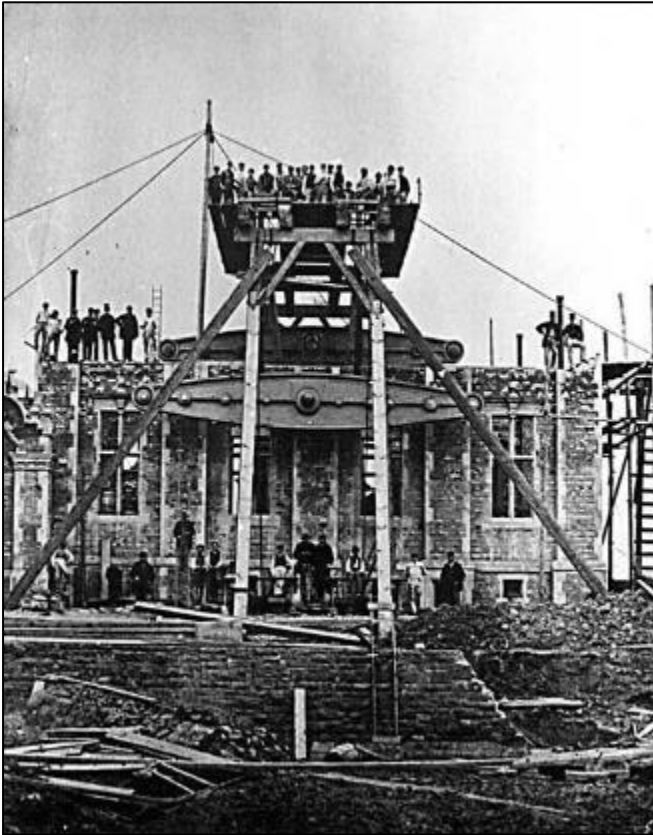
Erection of the second beam at Ryhope Pumping Station, Sunderland c.1868 showing how a travelling scaffold rig can be used to move the engine beam into place prior to completion of the building.
